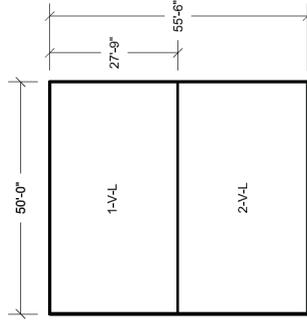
H.6-114: COOLING TOWER EAST WALL LOOKING WEST
